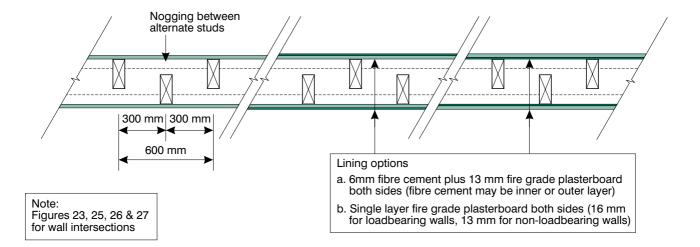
STAGGERED STUD WALLS (FRL 60/60/60)
